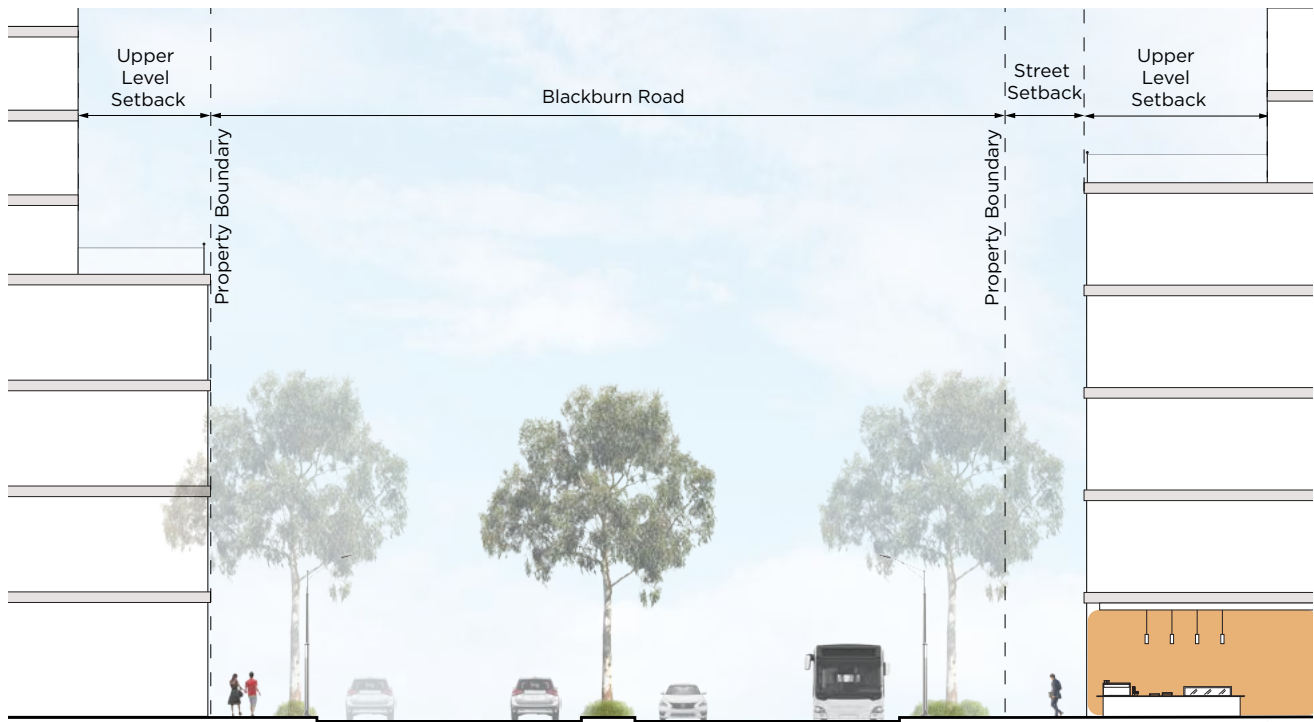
Section E - Illustration of potential typical section of Blackburn Road and built form interface
